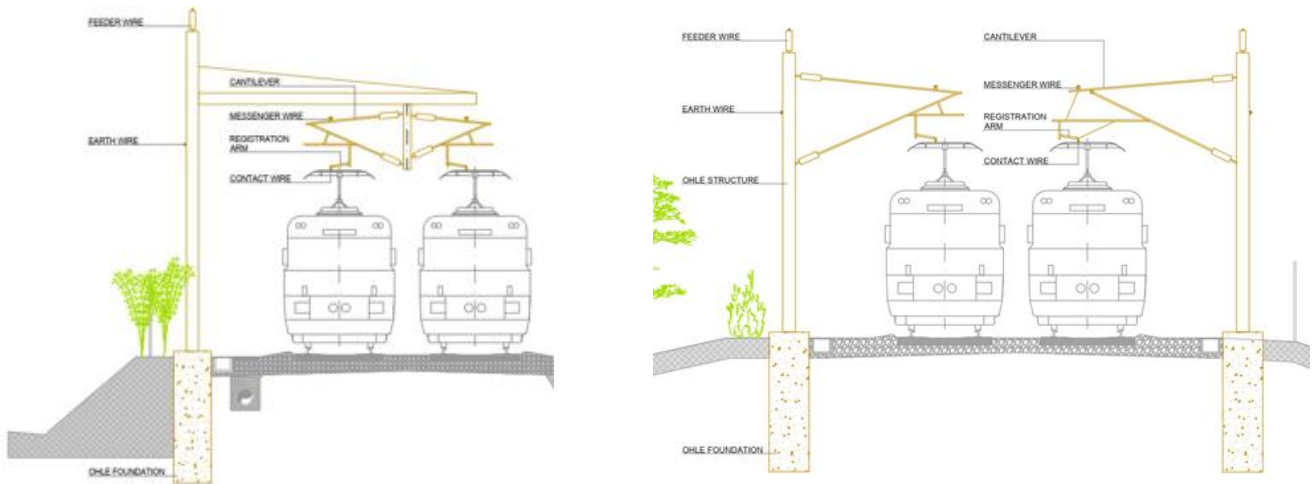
Alternative OHLE Arrangements in 2-Track Section
